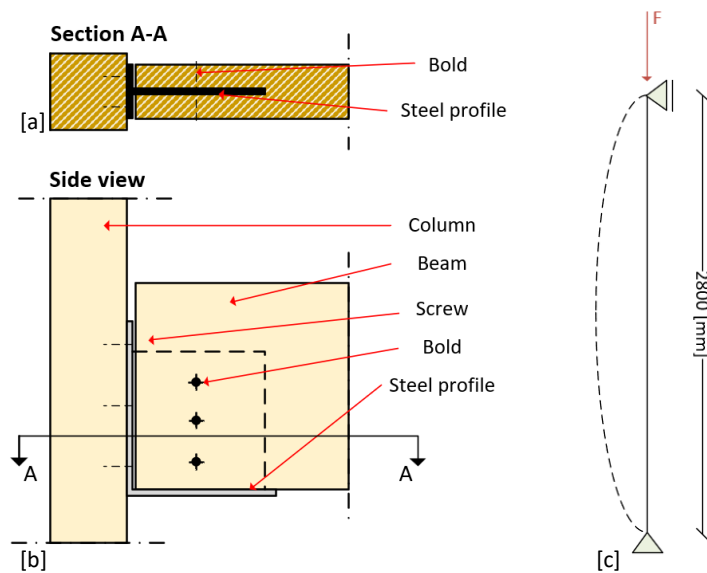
Gallery column; [a] Top section connection column-beam; [b] Side view connection column-beam; [c] Schematization column (Self-produced).
